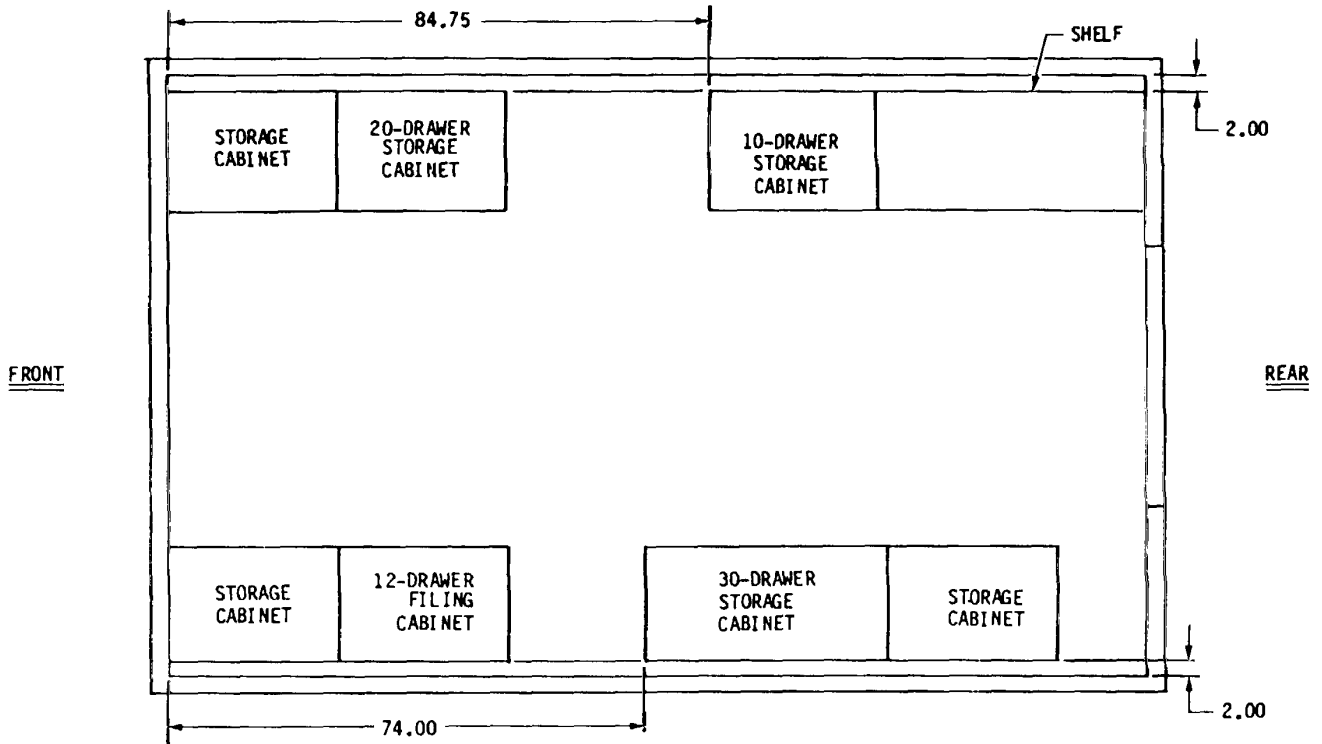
Dimensions for Locating Storage Cabinets, Unit 1, 280, Floor Plan
